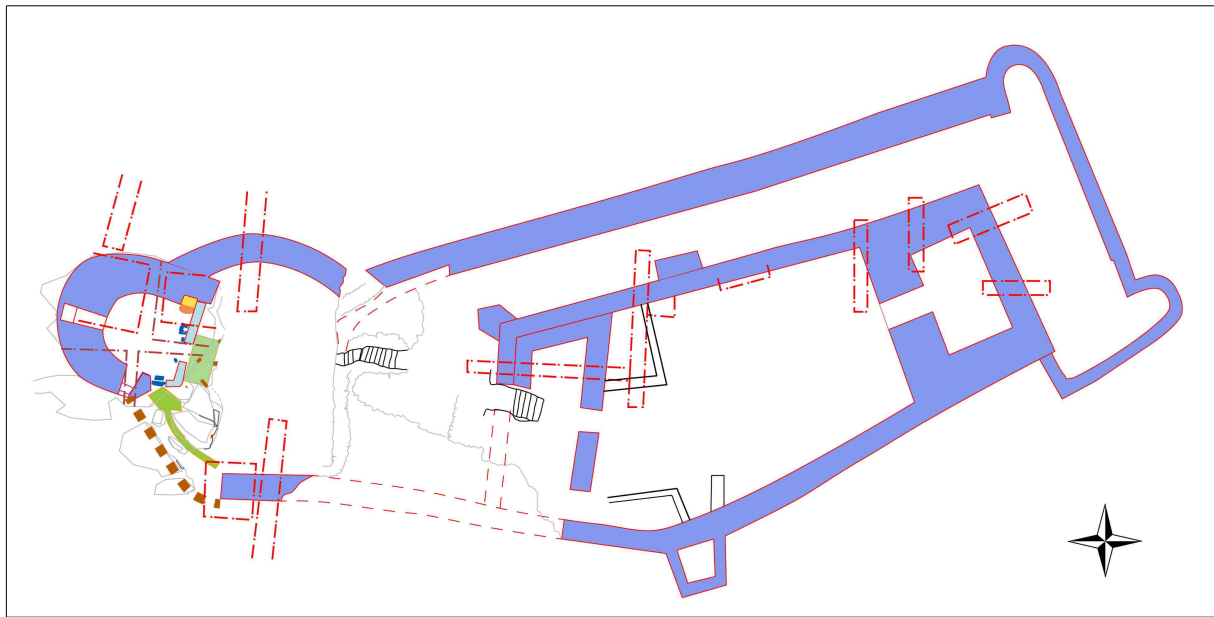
Ground plan of Drégely Castle showing the excavation trenches.
